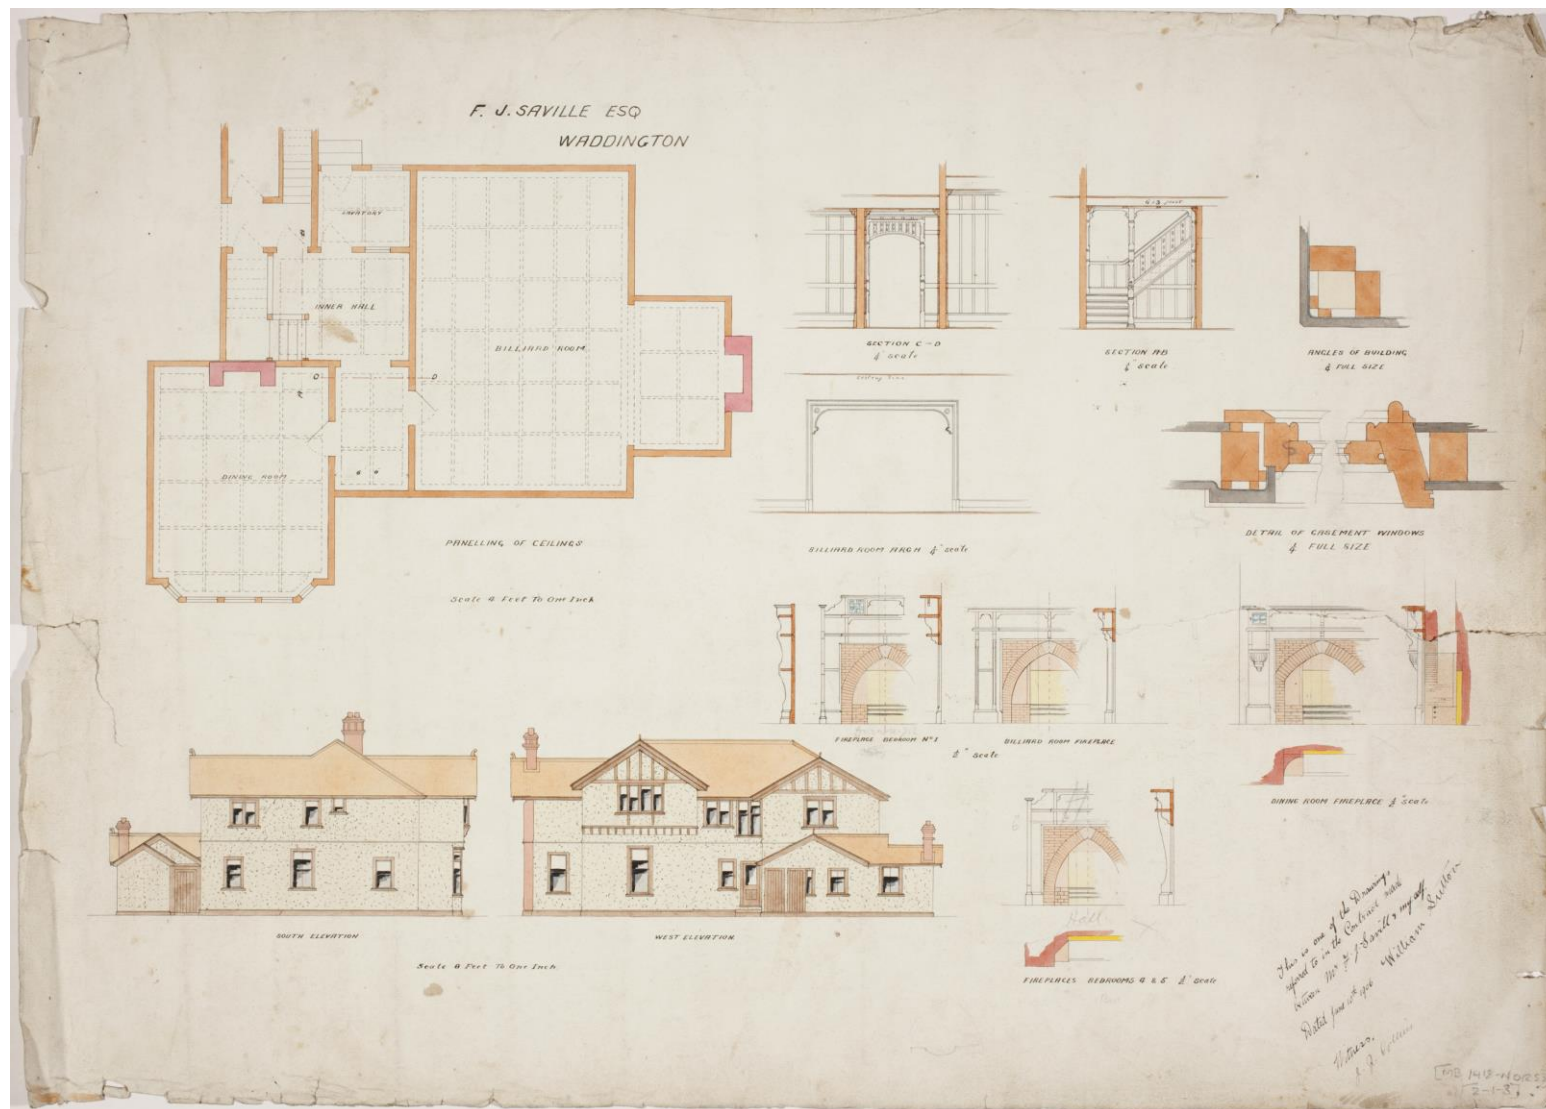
Collins and Harman, F. J. Saville [sic], Esq., Waddington, elevations and details (1906).
